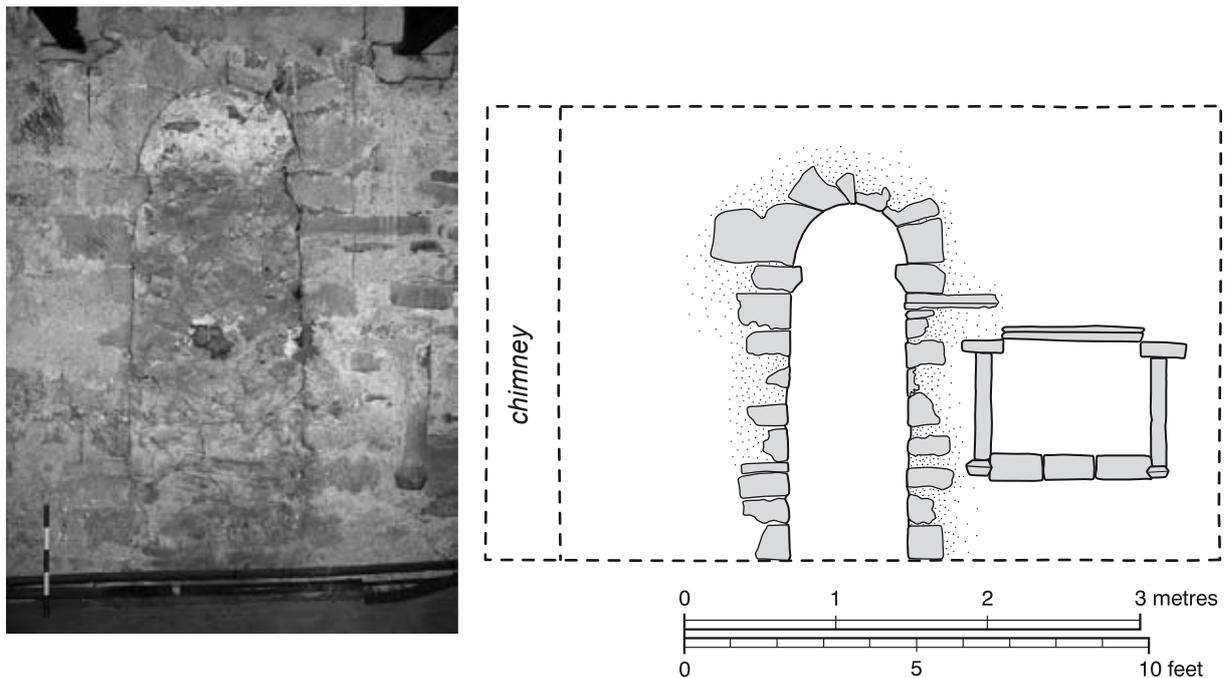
Photograph and drawn elevation of blocked doorway in east wall of tower, and adjacent recess, showing inter alia the extent of mortar/plaster rendering
